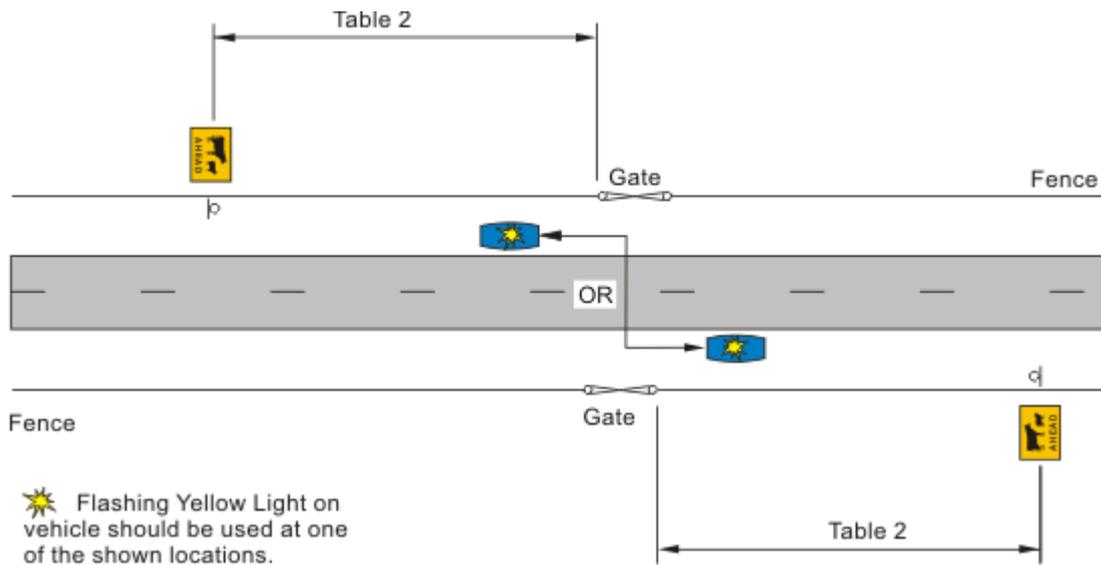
Typical Stock Crossing Site – for bitumen roads.
